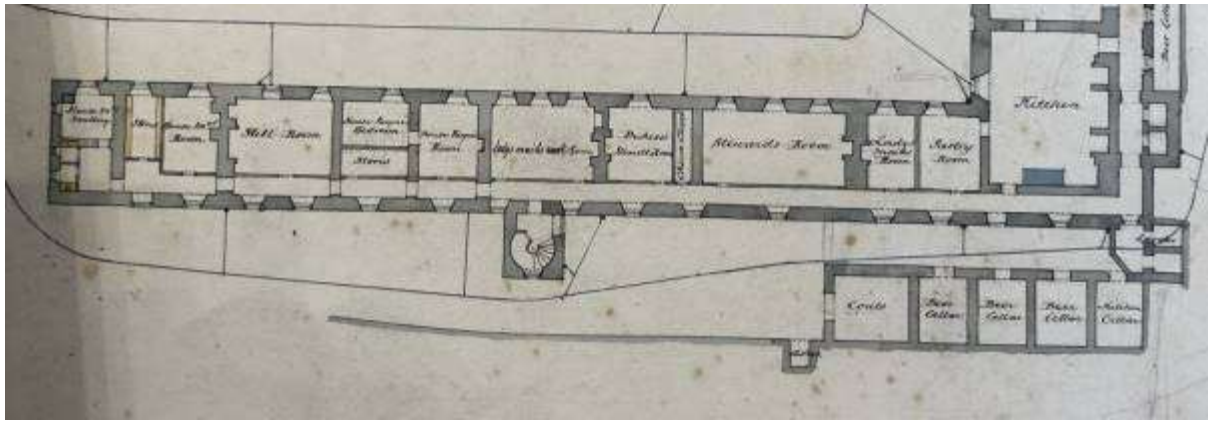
Ground floor survey plan, post 1885, pre 1920 without gateway & outhouses in bank. BCA.
